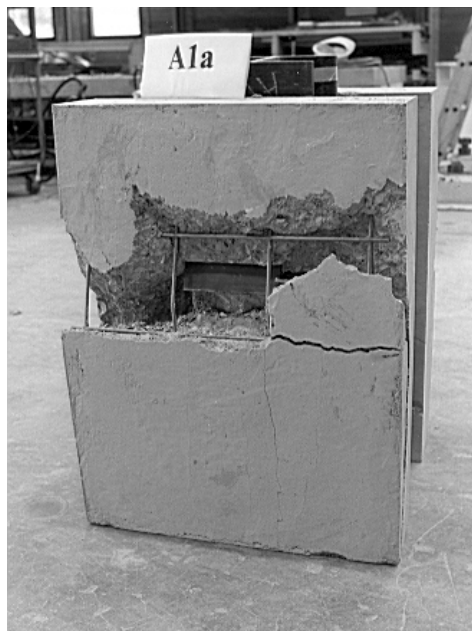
Concrete crushing-splitting failure: specimen A1a.
